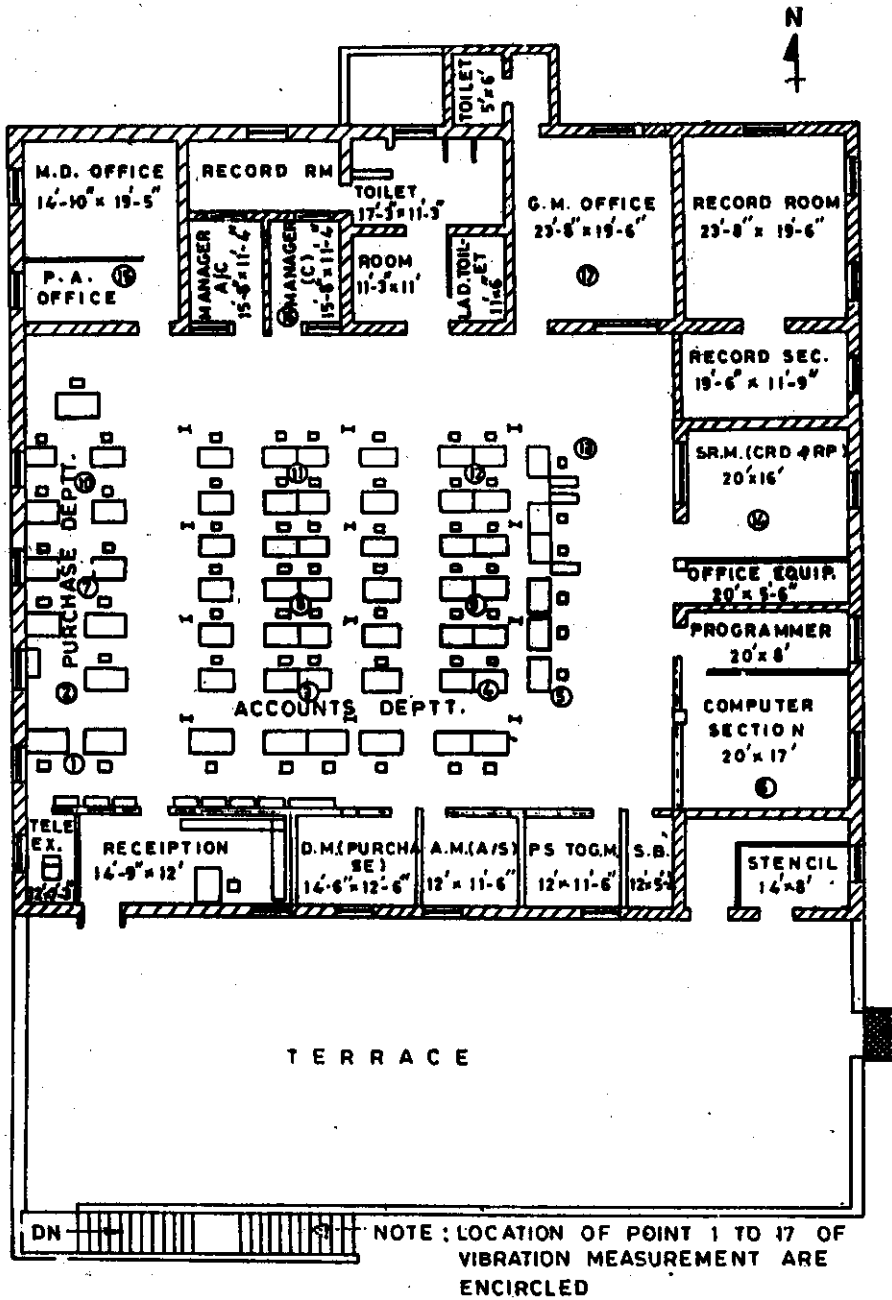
PLAN OF THE CENTRAL OFFICE BUILDING
